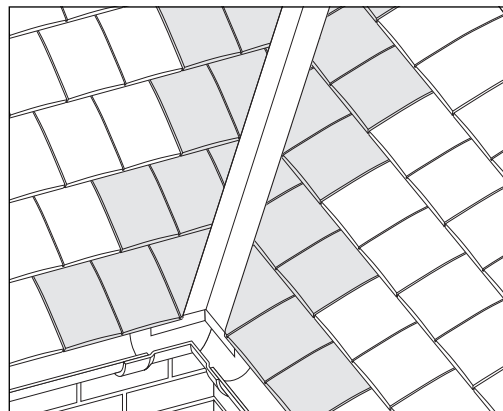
Typical bedded valley. Tile and a half tiles shown shaded.
